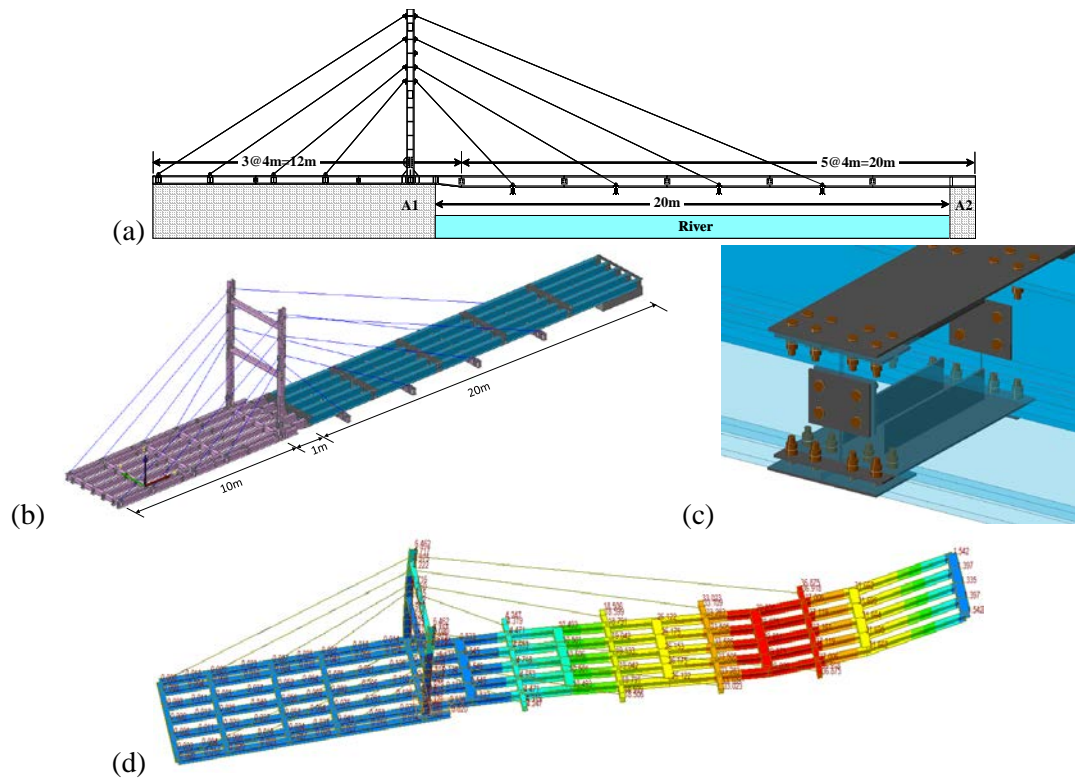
Design results of the 20 m span temporary composite bridge: (a) the front view (b) the 3D view, (c) the bolted connection using bolts and a steel connection plate, and (d) the shape of deformation.
